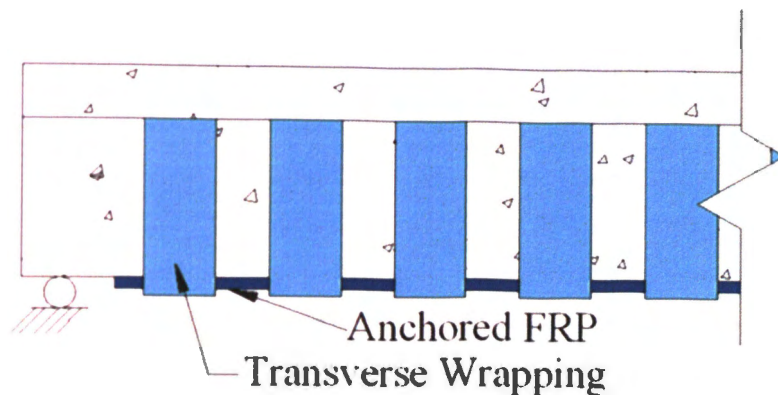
Example of Transverse Wrapping Anchorage on T-Beam
